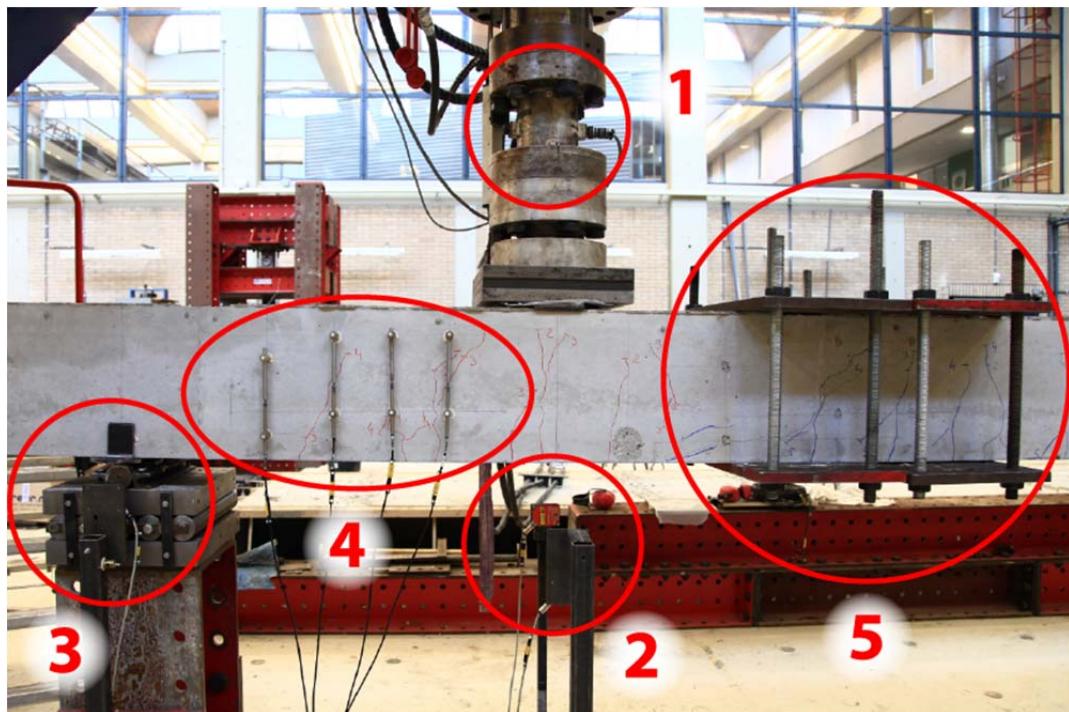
Measurements (1-4) and strengthening of cracked specimen (5)
